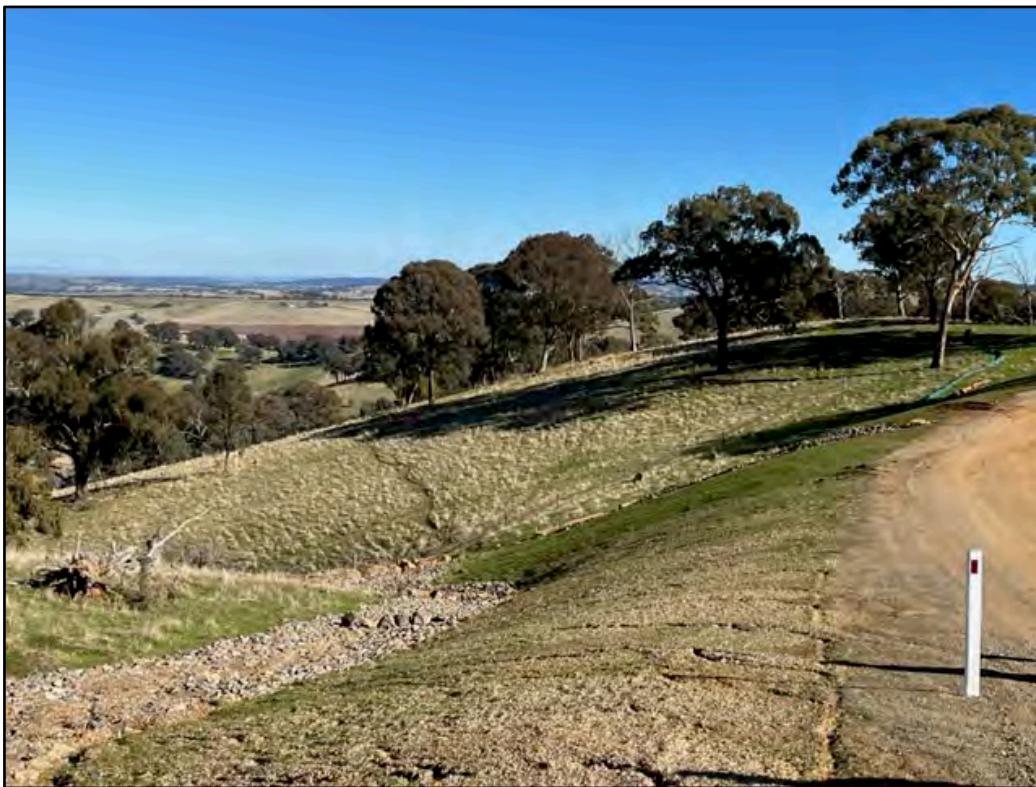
View of road repair/rectification works on roadways adjoining the Project site as observed on 10 May 2023. Works were conducted in consultation with Blayney Shire Council with funding contributions from Flyers Creek Wind Farm.
